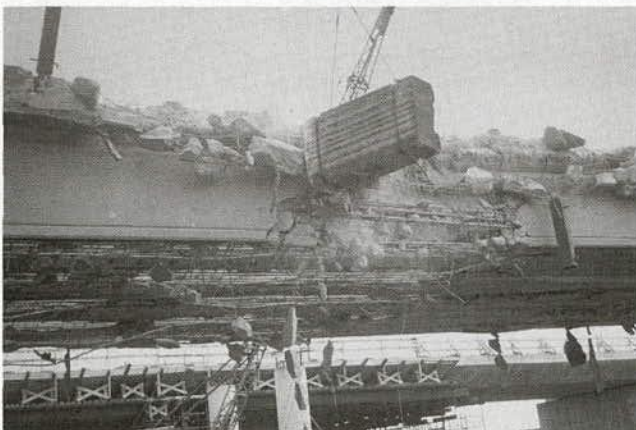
Use of a steel ingot as a "wrecking ball" to demolish a prestressed concrete bridge.
